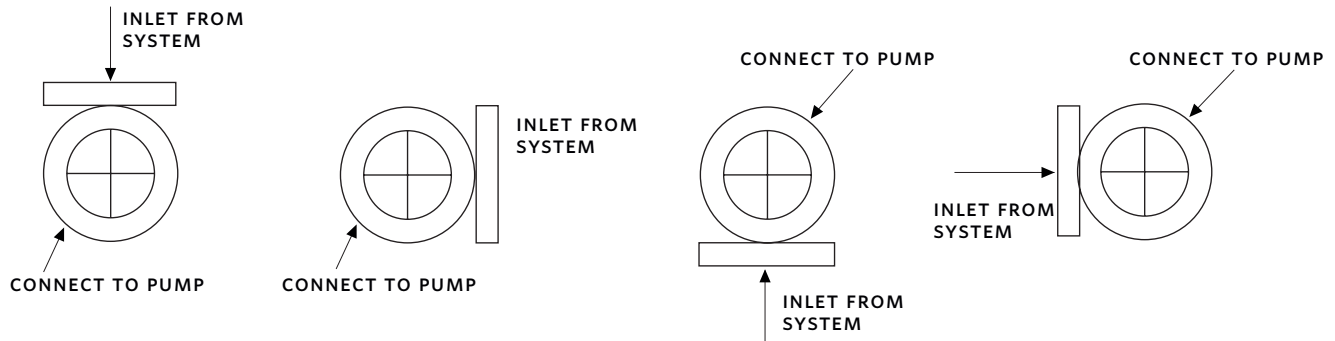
Armstrong Suction Guide may be installed in any arrangement feasible by pump flange boltholes arrangement.
